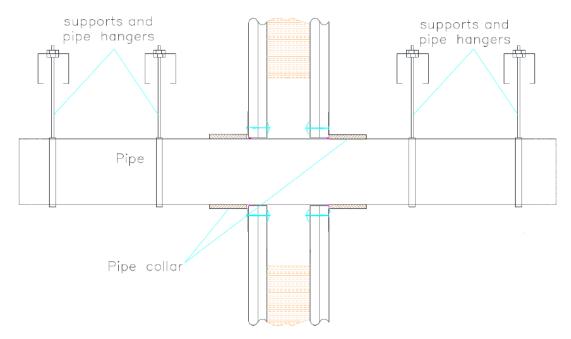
General arrangement of various plastic pipes protected with Protecta FR Collar installed at both sides of the wall
